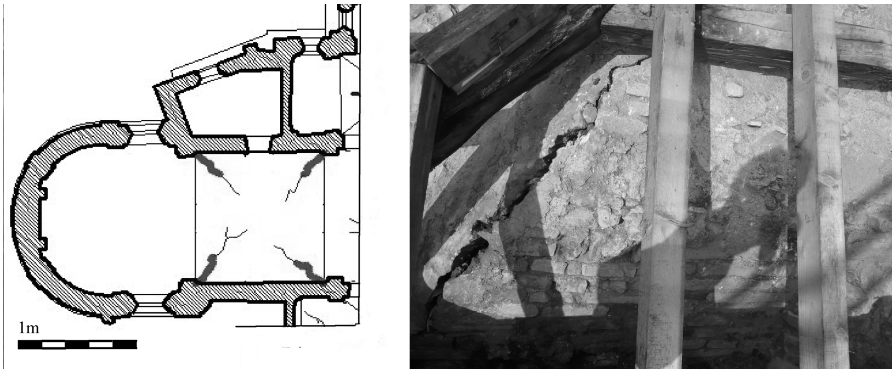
Schematic illustration of the crack pattern of the presbytery's pavilion vault of S. Pier d'Agrino church (left) and photograph of the crack along a diagonal from extrados (right).
